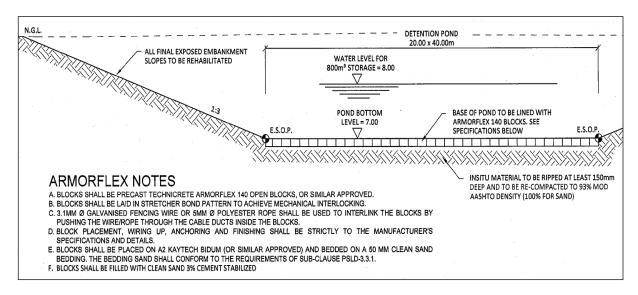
Detention Pond Armorflex Lined Bottom Detail (Including Armorflex Notes)
